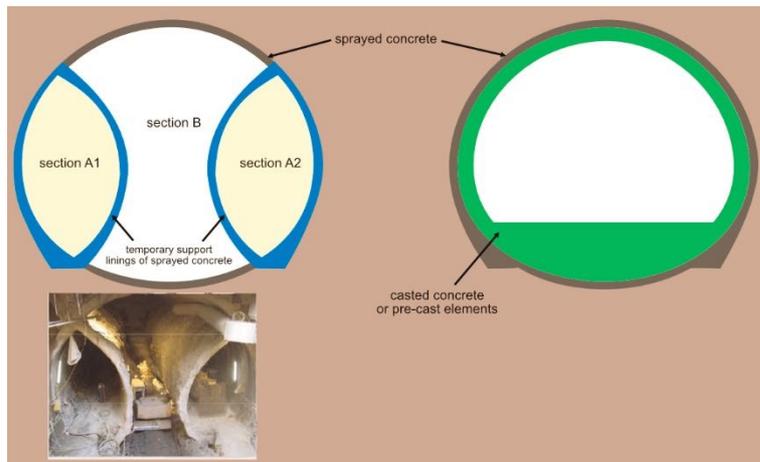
Schematics for the excavation method. First the sections A are excavated and then the section B. Under excavating section B the temporary support shotcrete linings are removed.
